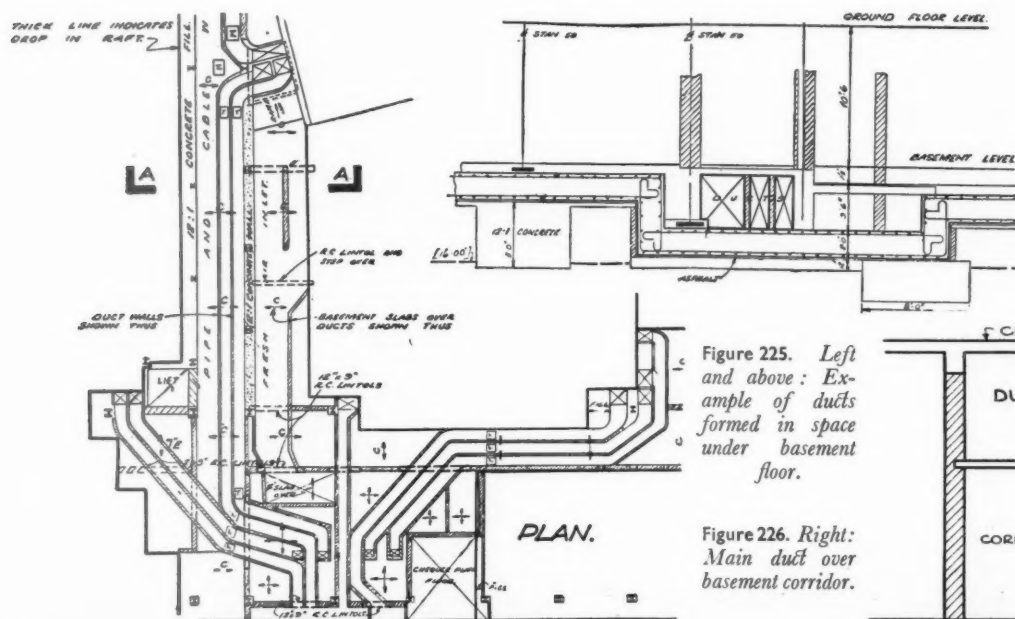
Left and above: Example of ducts formed in space under basement floor.
